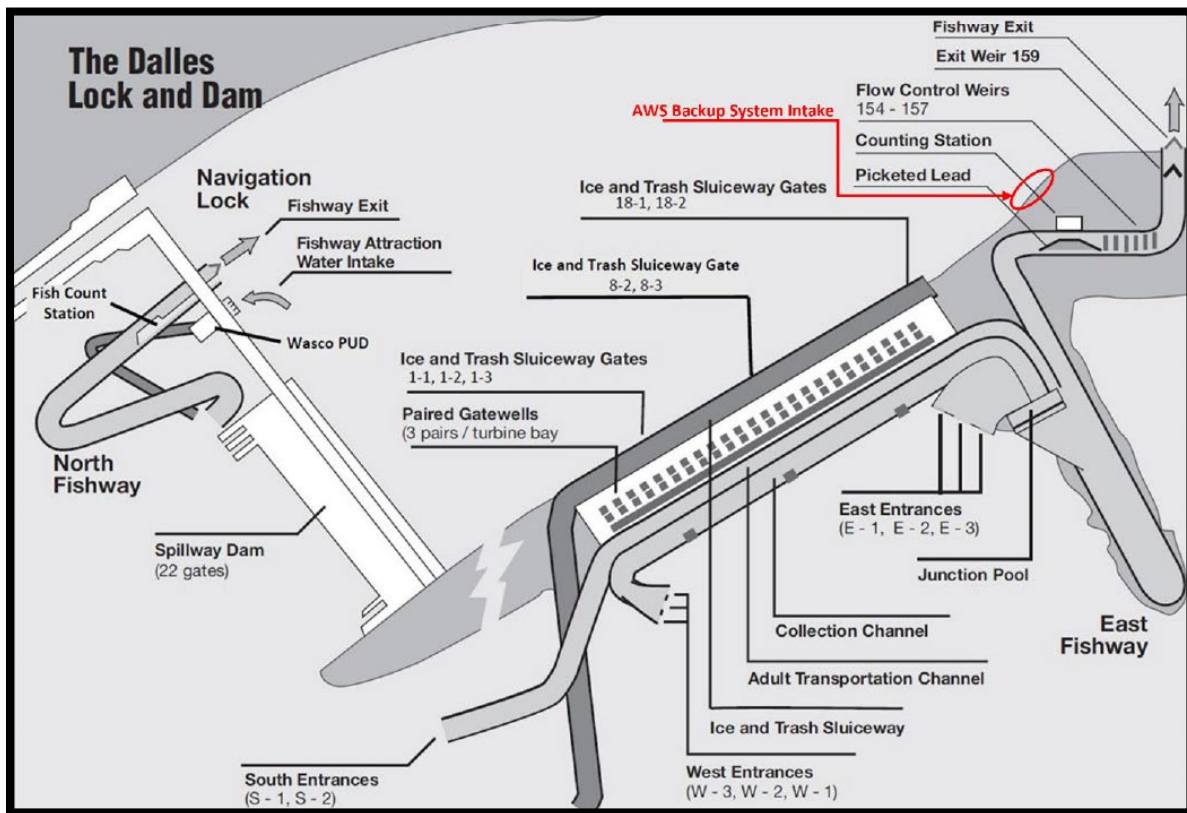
The Dalles Dam Fish Ladder System (USACE, 2022)
